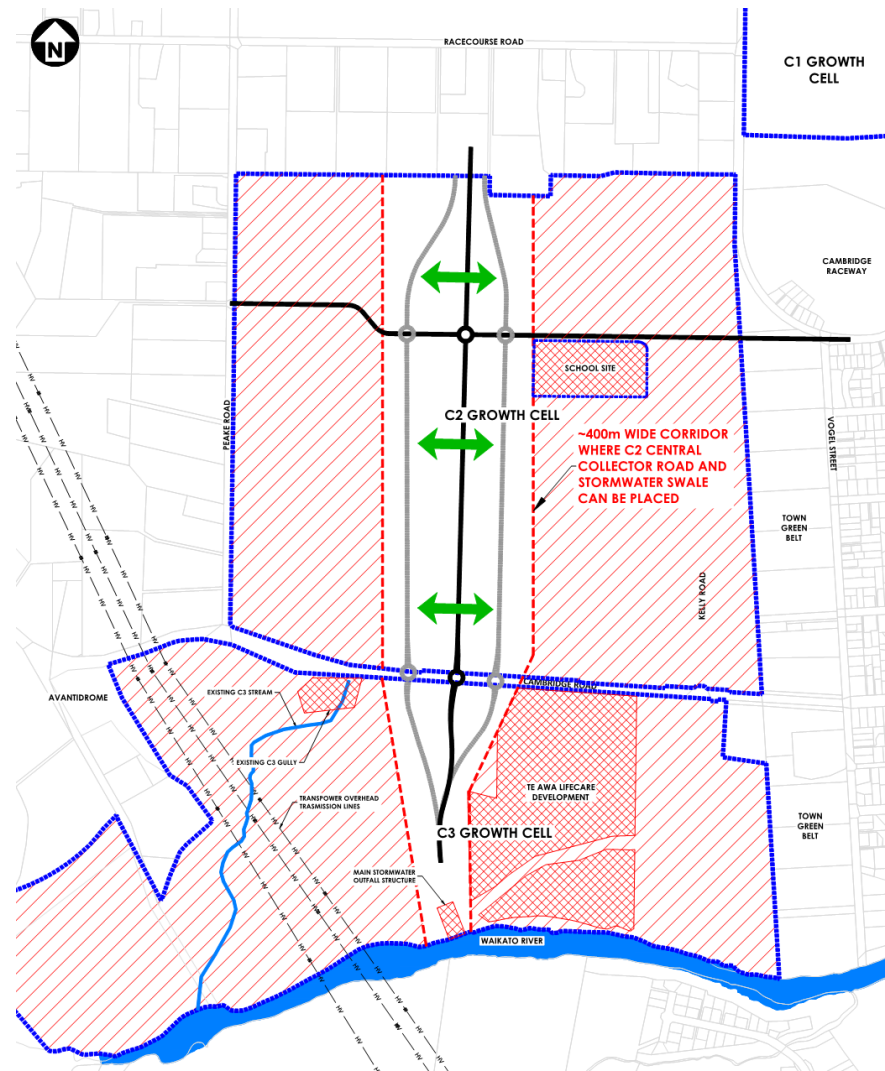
Constraints Plan for C2 Central Collector Road and Stormwater Swale
